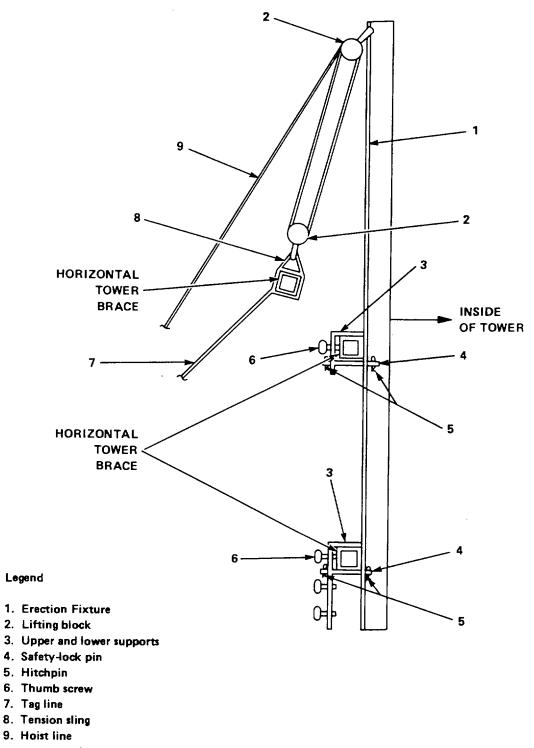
Tower Assembly {(Sheet 4 of 5)
